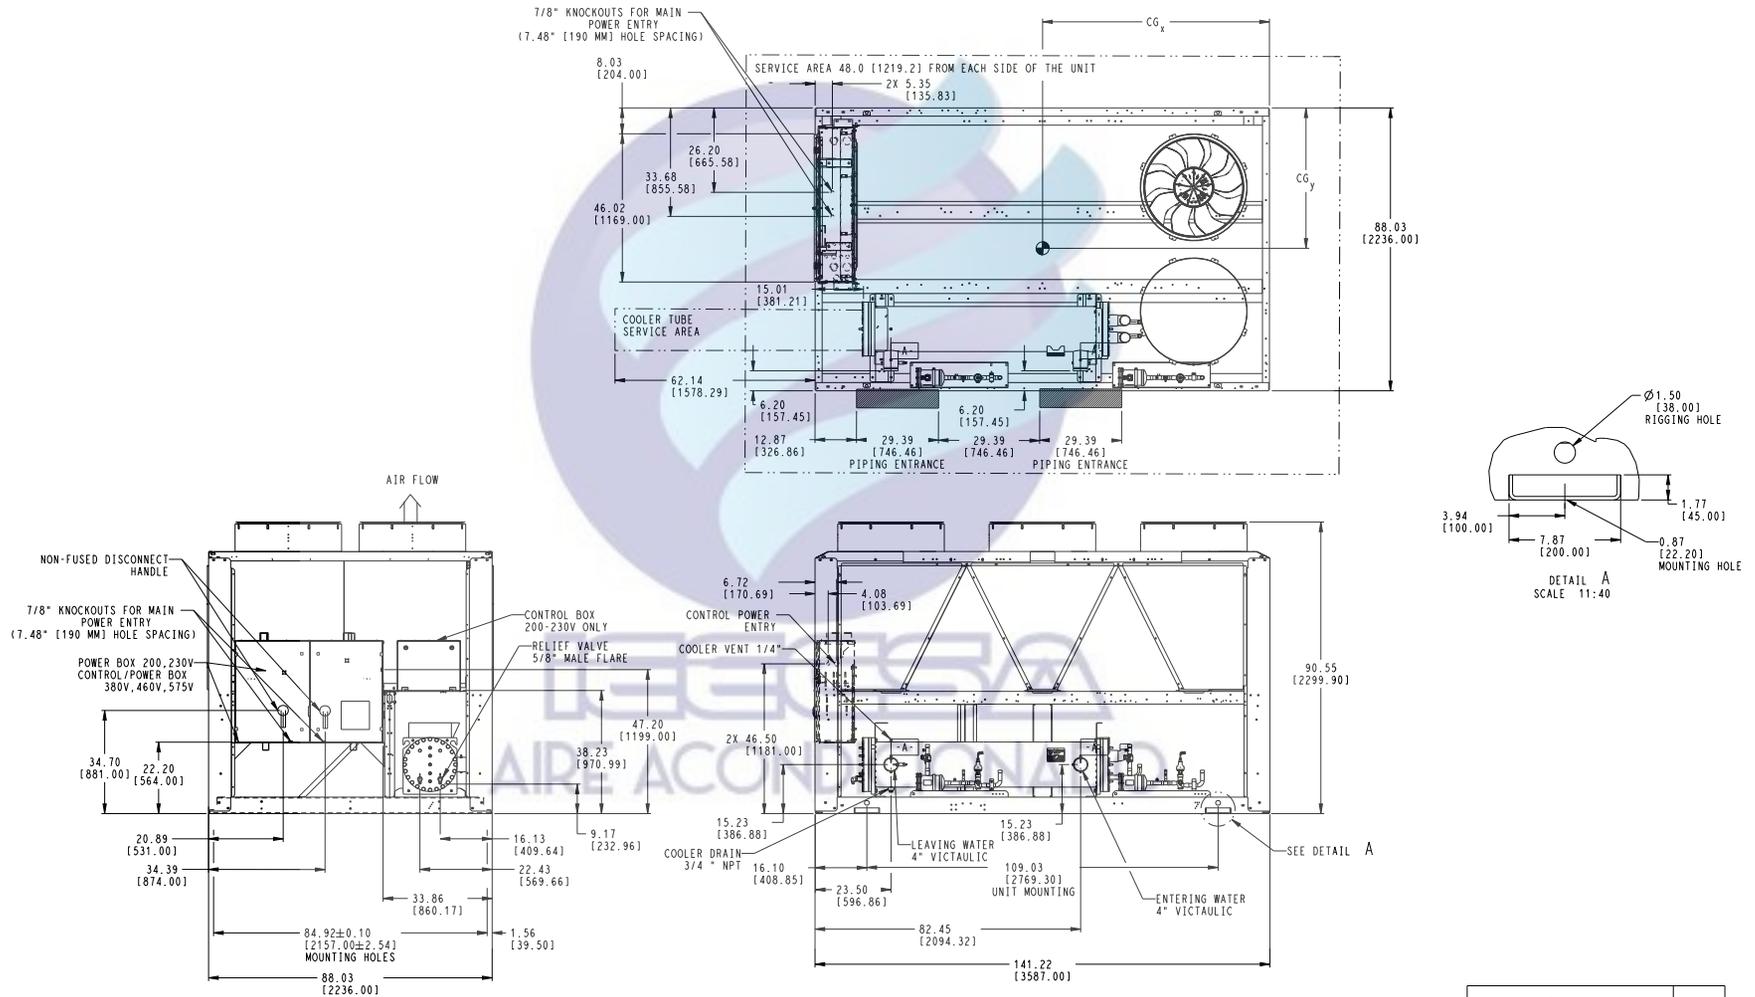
30XA082 Air-Cooled Liquid Chiller Dimensions
